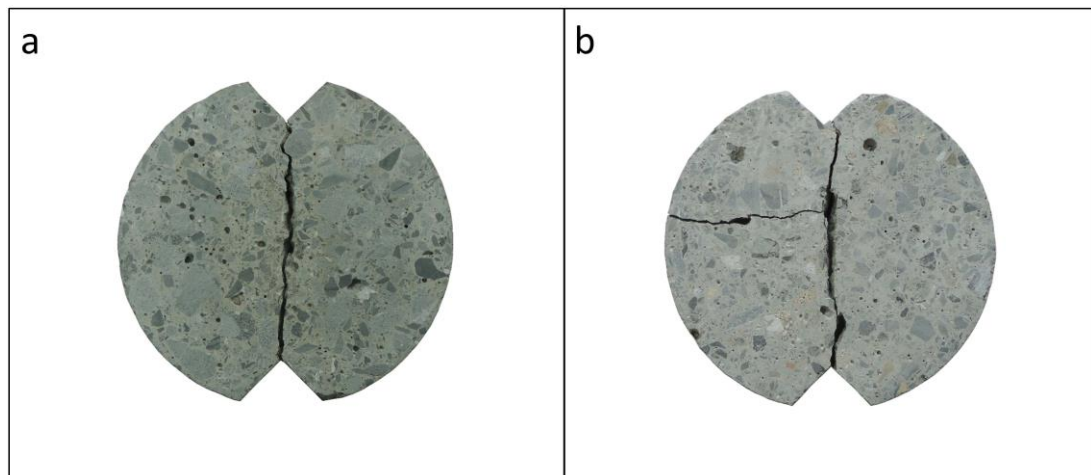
Notched specimens: (a) Accepted failure, (b) Rejected failure.
